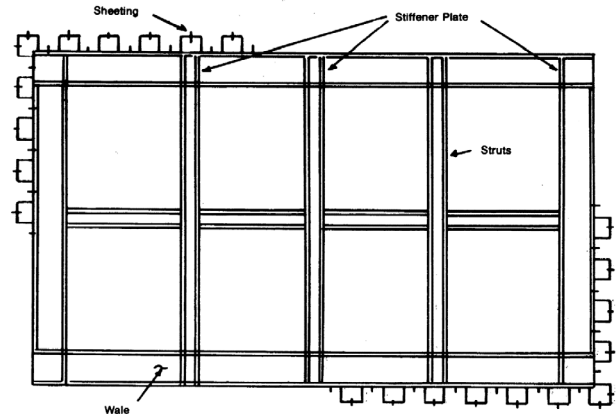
Typical Strut Arrangement for a Braced Excavation
